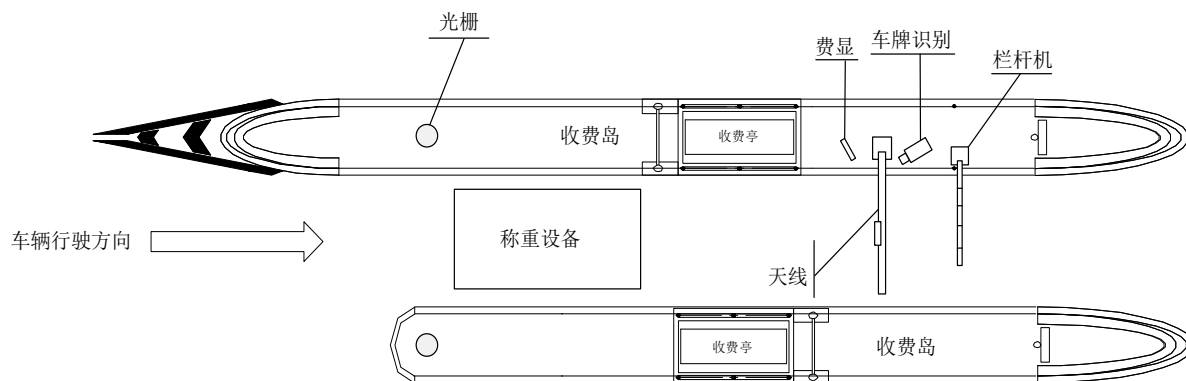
Post layout plan of the single antenna rail for the truck ETC driveway
